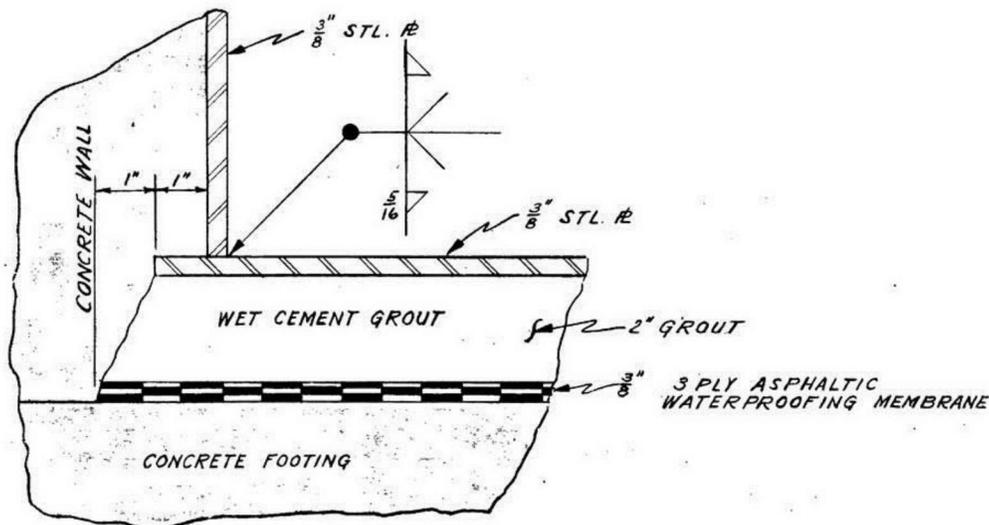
Construction Drawing for 241-SX Farm, 100-Series, Type IV Tanks Bottom to Wall Transition Weld
